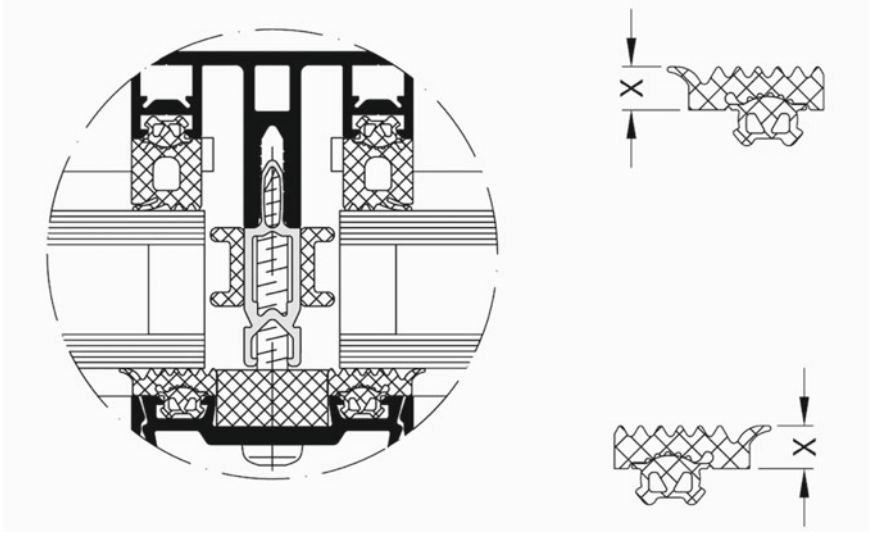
Transverse geometry of the external crawler seals that detects: ● the composition according to the insertion part in the cavities, included in the pressure profile; ● the inner part equipped with the gripping elements, towards the outer surface of the enclosures. © Courtesy of Schüco
